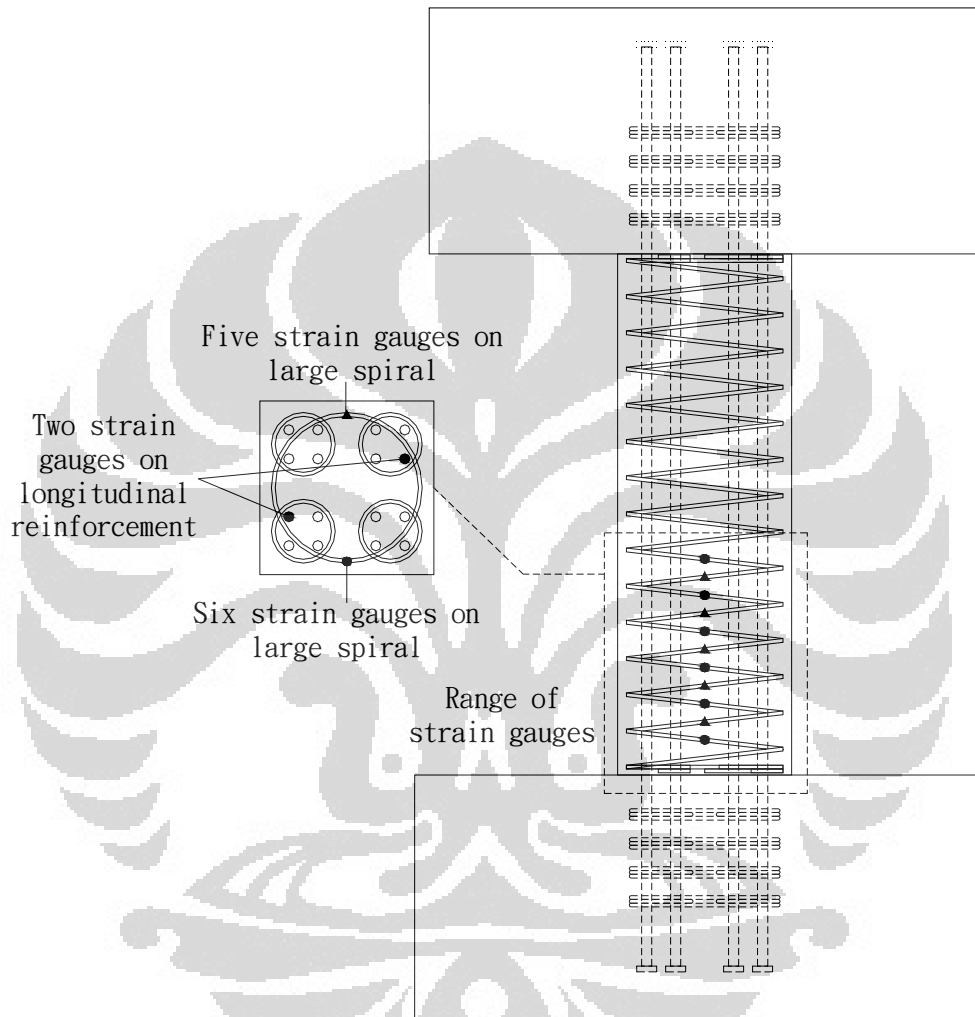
Arrangement and numbering of strain gauges on the transverse and longitudinal bars for type S1 specimen with 125 mm of transverse reinforcement spacing
